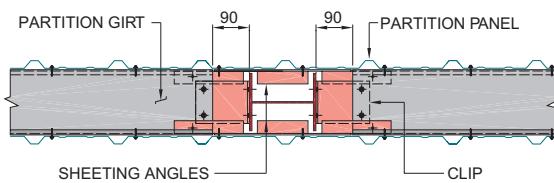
DETAIL-D: PARTITION COLUMN CONNECTION AT RAFTER
